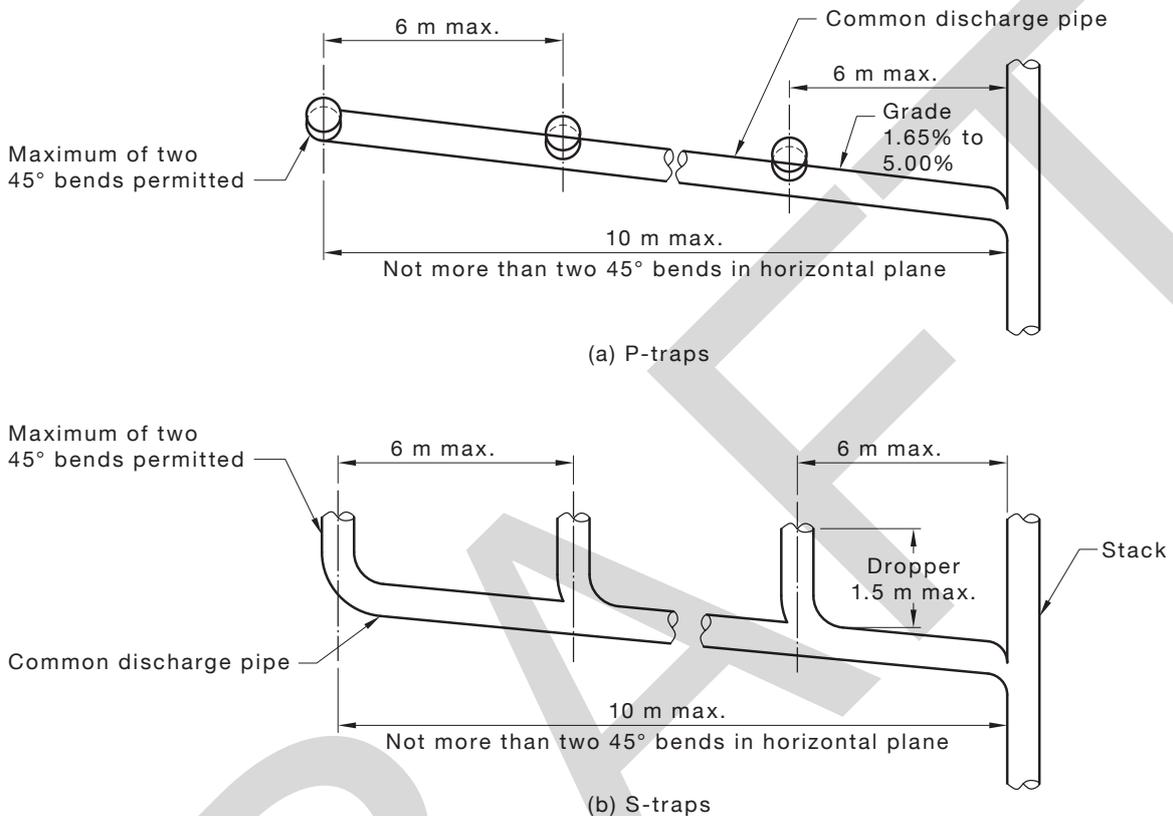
CONNECTION OF WATER CLOSET PANS
